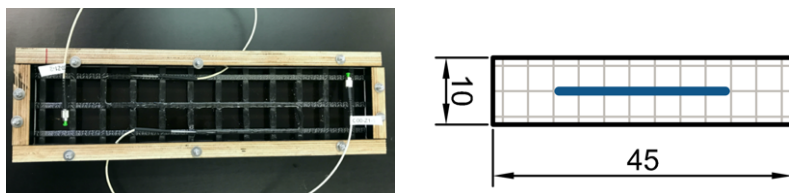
Formwork for tensile specimens with installed DFOS sensors and location of DFOS sensors in the specimen
